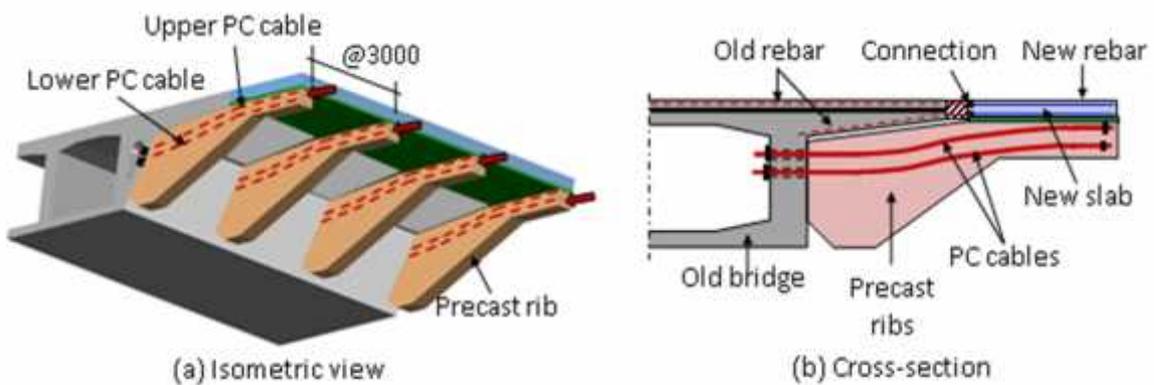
The new prestressed concrete (PC) box girder widening technique.
